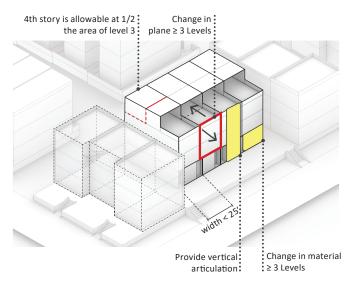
BUILDING MODULATION & ARTICULATION
